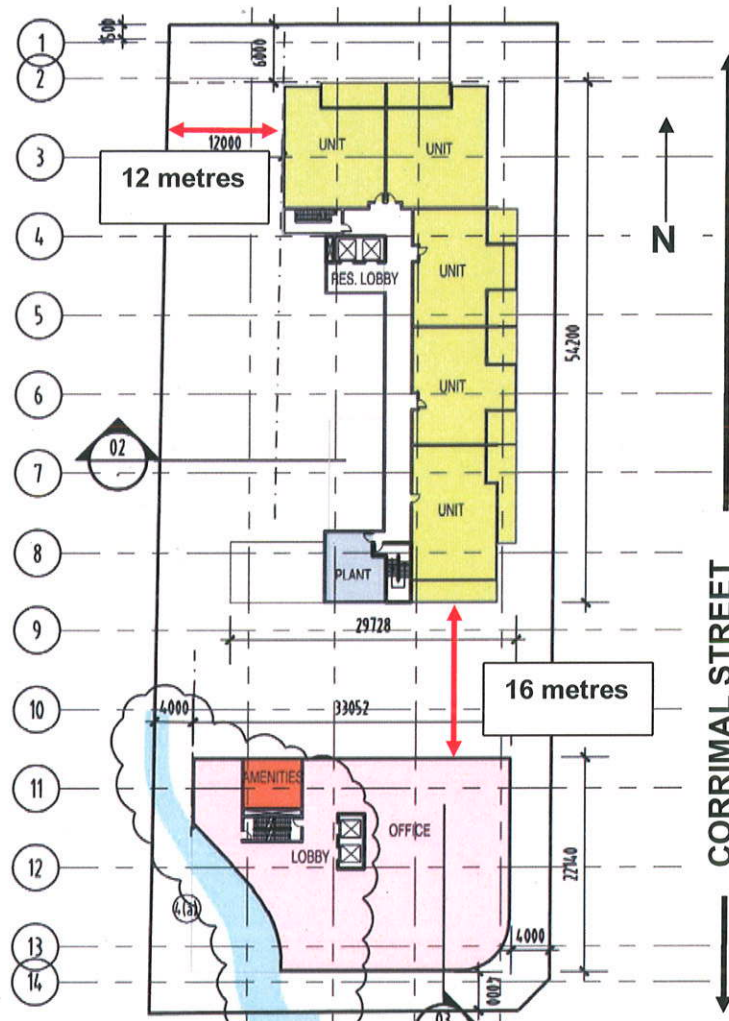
Typical layout of the proposed residential and commercial towers on the Oxford Tavern site with red arrows showing separation distance to nearest adjacent buildings.
